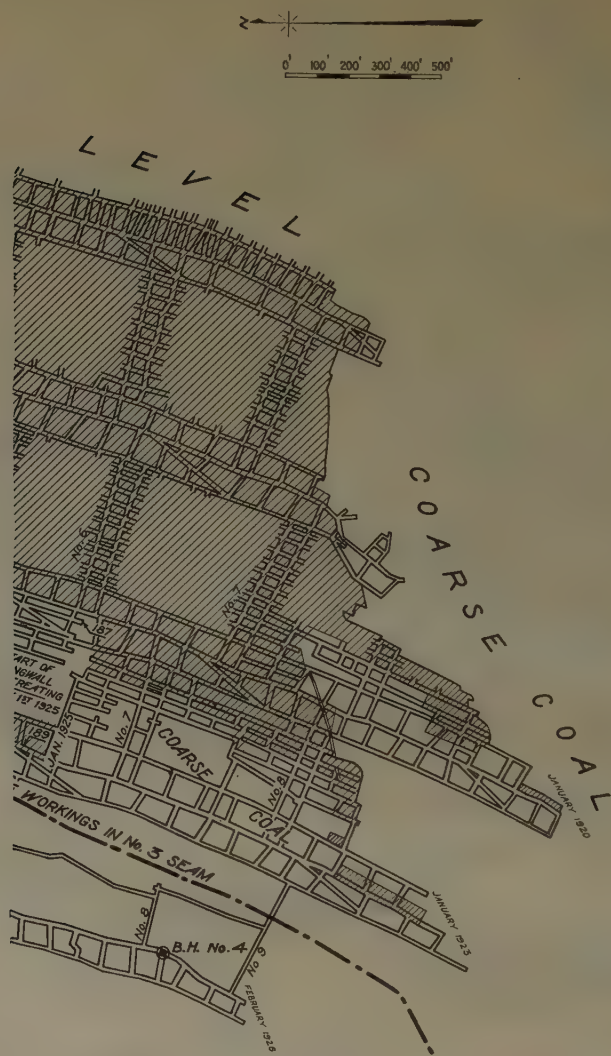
PART PLAN OF NO. 2 COLLIERY, SPRINGHILL, N. S.
